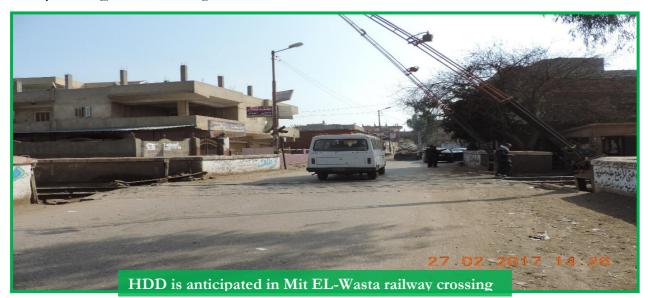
Pictures showing the proposed location HDD crossing in Mit EL-Wasta railway crossing
